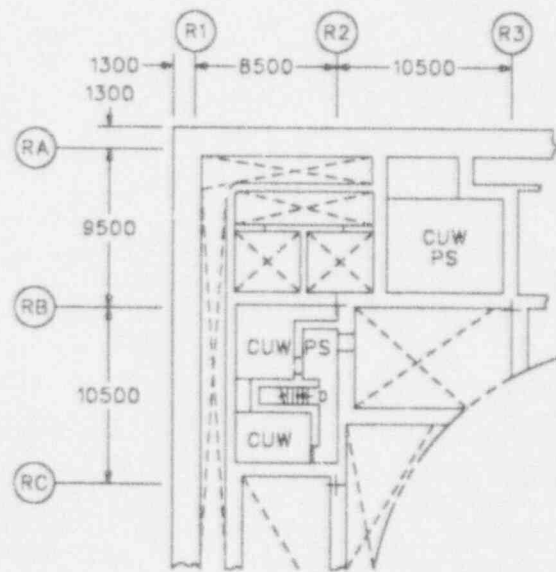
Reactor Building Arrangement Floor B3F with Divisional Boundary for Fire—Elevation -8200 mm
